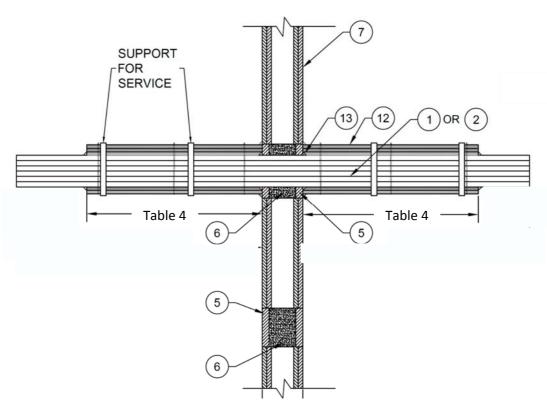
Typical details for wrapped cables in plasterboard lined walls
